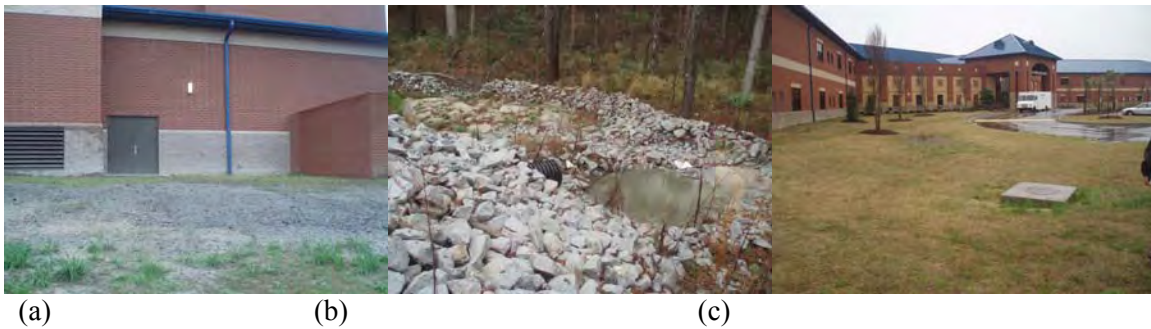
(a) Downspouts directly connected to the storm drain system at W.J. Keenan High School; (b) Stormwater outlet; and (c) Proposed bioretention area at the high school.
